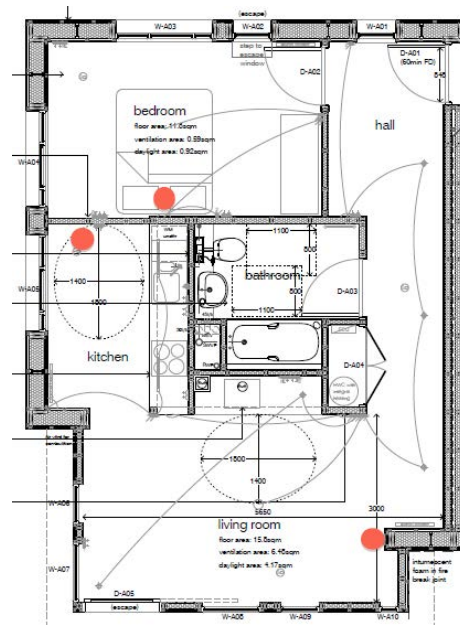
57: Floor Plan and sensor location Plot 9BB and 11BB.
